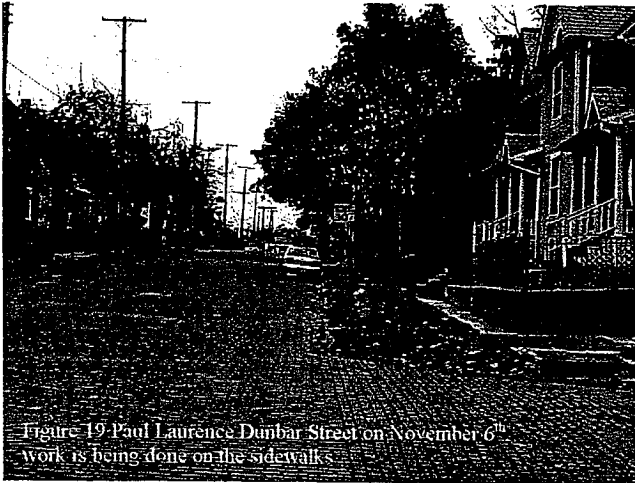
Paul Laurence Dunbar Street on November 6<sup>th</sup> work is being done on the sidewalks
